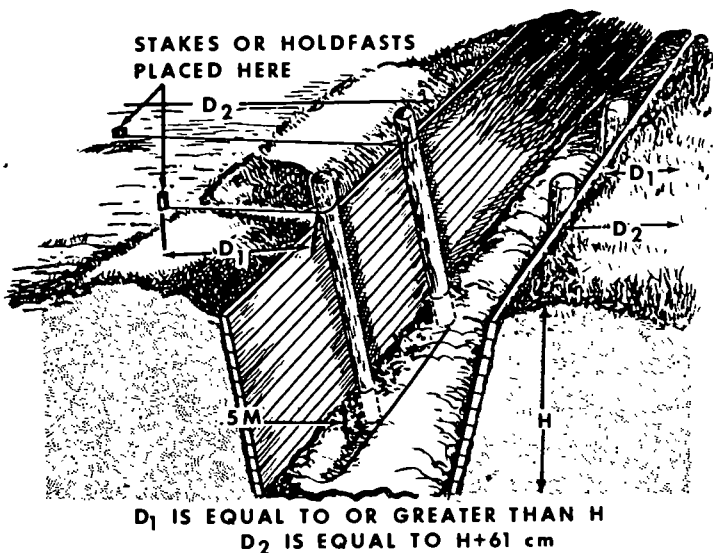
Method of anchoring retaining wall posts/pickets.
